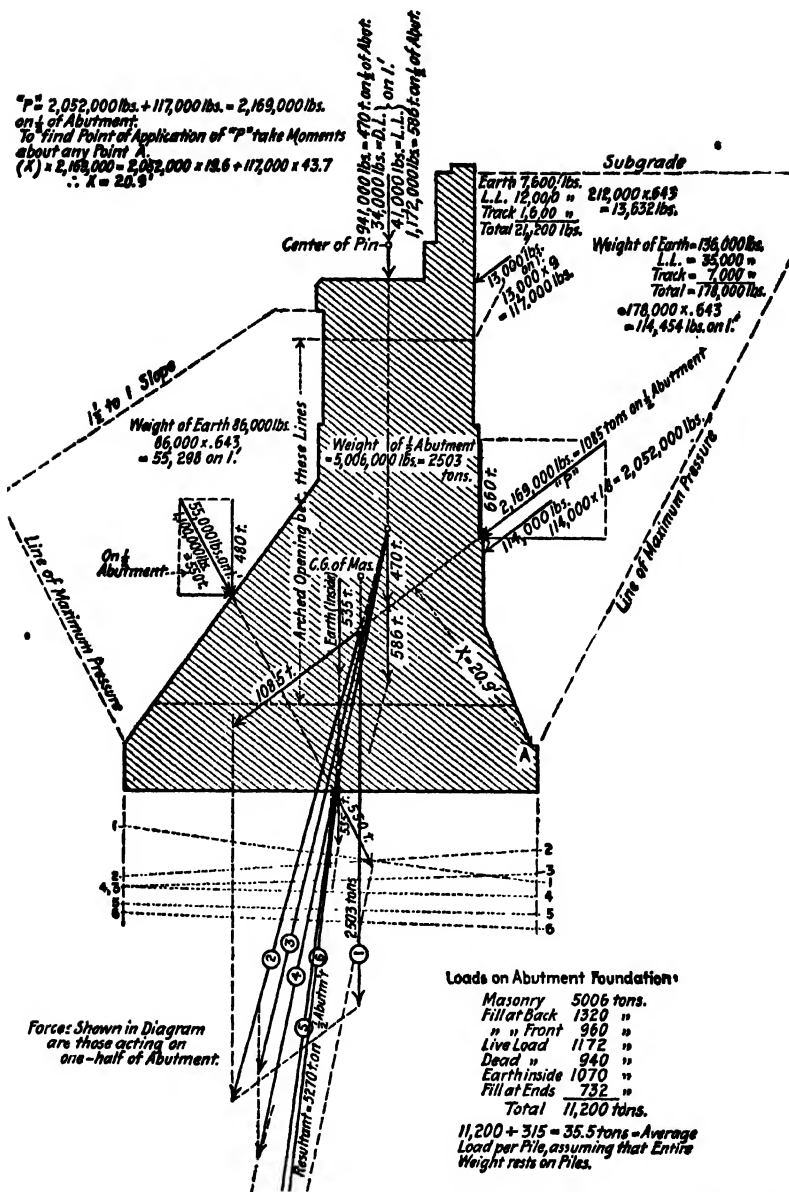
Diagram of Forces Acting on North Abutment and Its Foundation. Pittsburgh and Lake Erie Railroad Bridge over Ohio River at Beaver, Pa., 1908-10.
